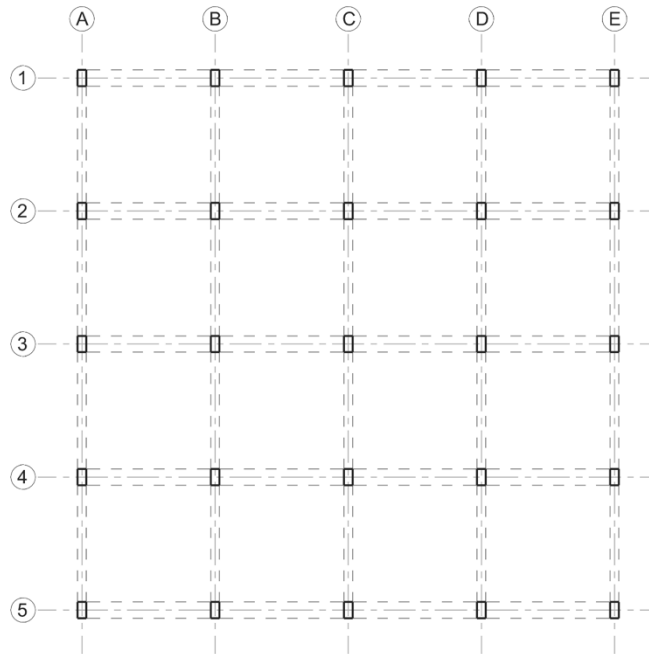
Typical Grid Plan Layout for Frame Structure
